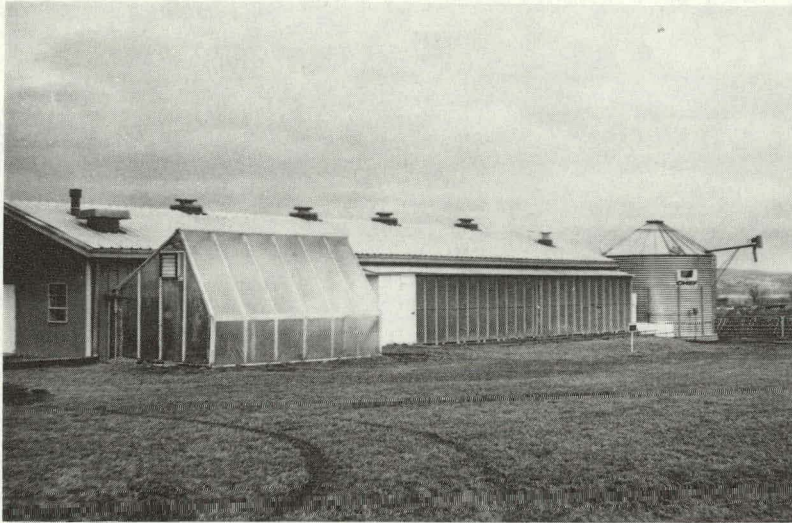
Kansas State University farrowing house, solar collector-storage wall, grain drying system and an experimental greenhouse warmed by exhaust air from the farrowing house.
